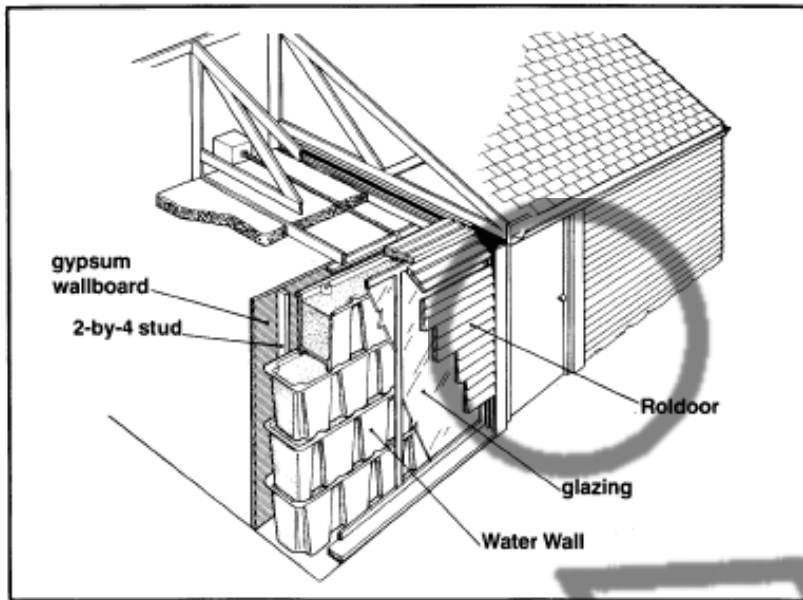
The Roldoor system with stacking Water Wall modules.
